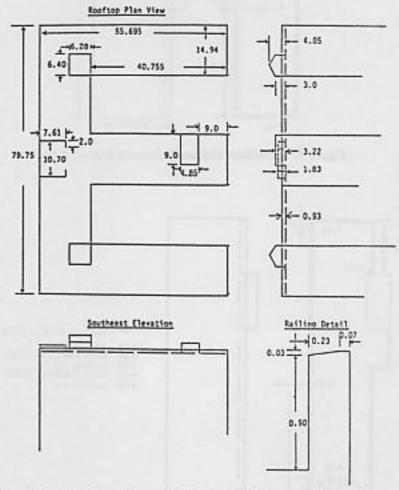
Hiroshima University Faculty of Science, rooftop configuration. Building height, 13.43 m; internal wall thickness, 60 cm; constructed of concrete (outside). Dimensions in meters
